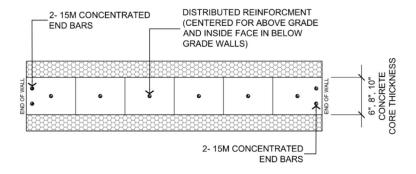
2. Walkout Basement Wall of a Two-Story Wood Framed Structure Supporting Wood Frame Floors and Roof (TYPE W2).
